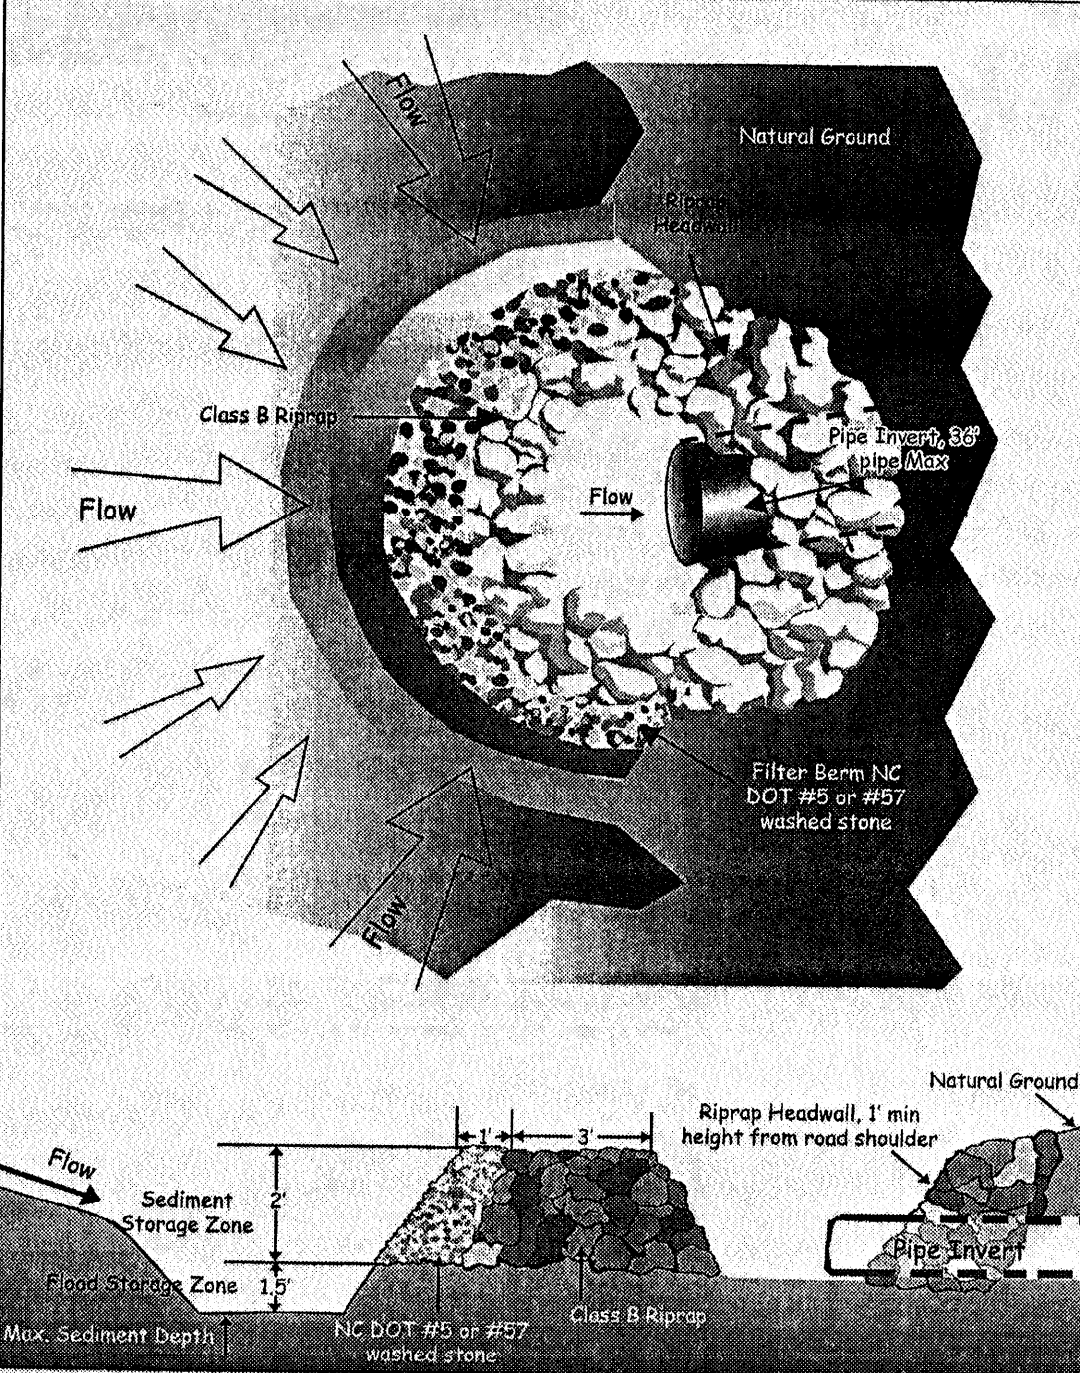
Rock pipe inlet protection plan view and cross-section view.
